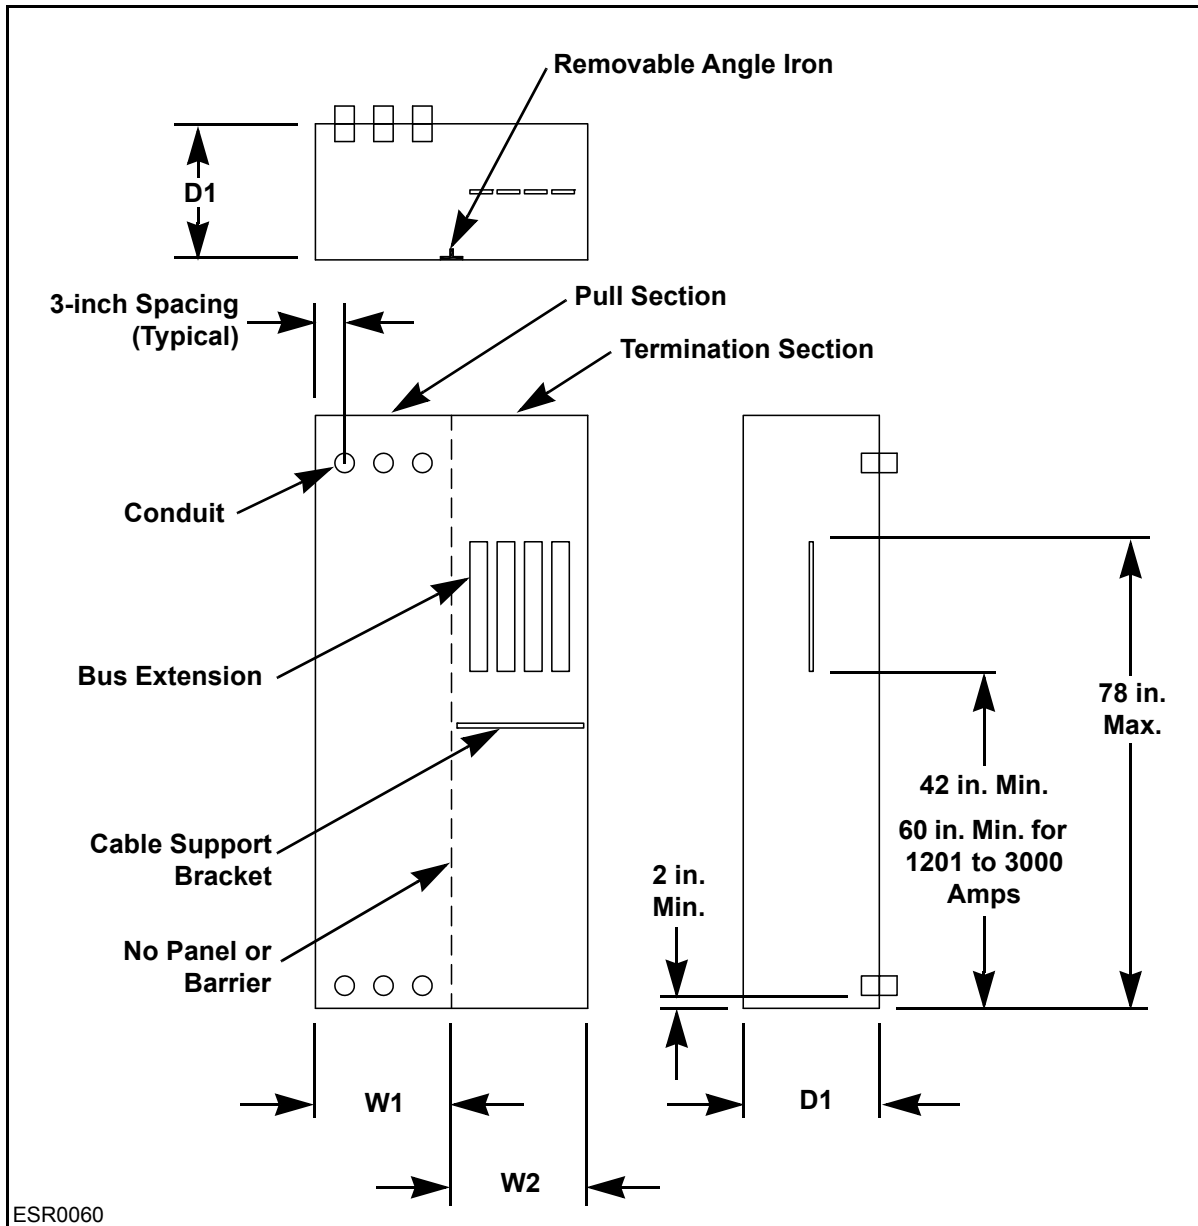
Underground Service Termination in a Pull Section Below the Ground Level, Showing Pull Section With Back-Entry Conduits at the Top or Bottom
